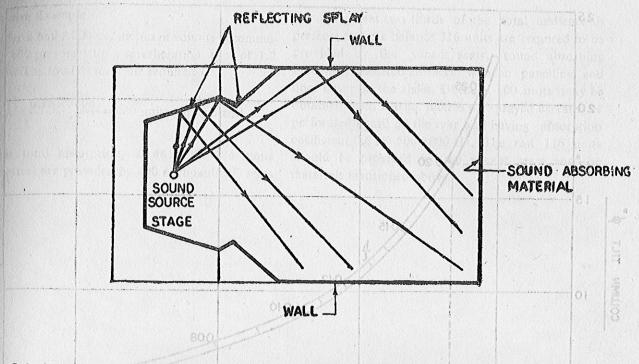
PLAN OF RECTANGULAR HALL SHOWING USEFUL REFLECTIONS FROM THE WALLS PLUG AND STAGE INSETS.
